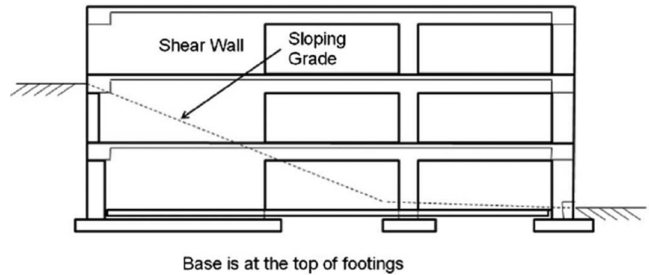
Building with vertical elements of the seismic force-resisting system supporting lateral earth pressures.
